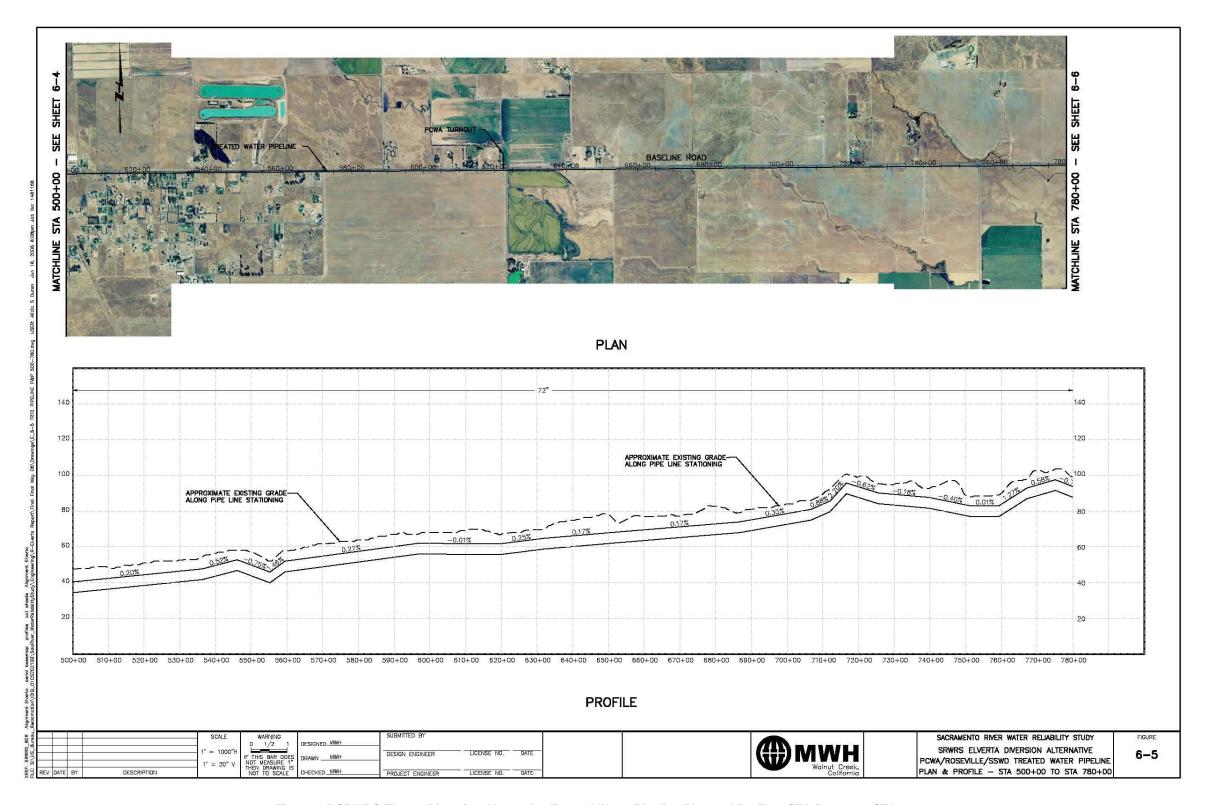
SRWRS Elverta Diversion Alternative Treated Water Pipeline Plan and Profile – STA 500+00 to STA 780+00
